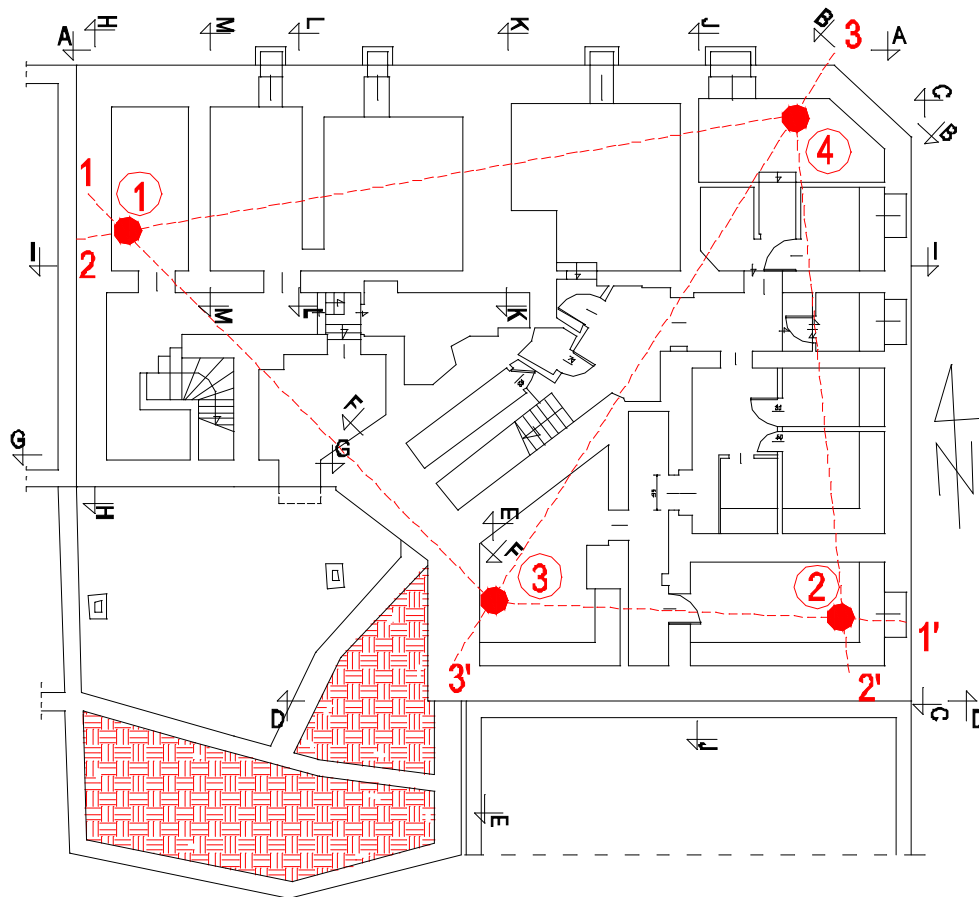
Layout of basement walls with location of boreholes and geotechnical cross sections
